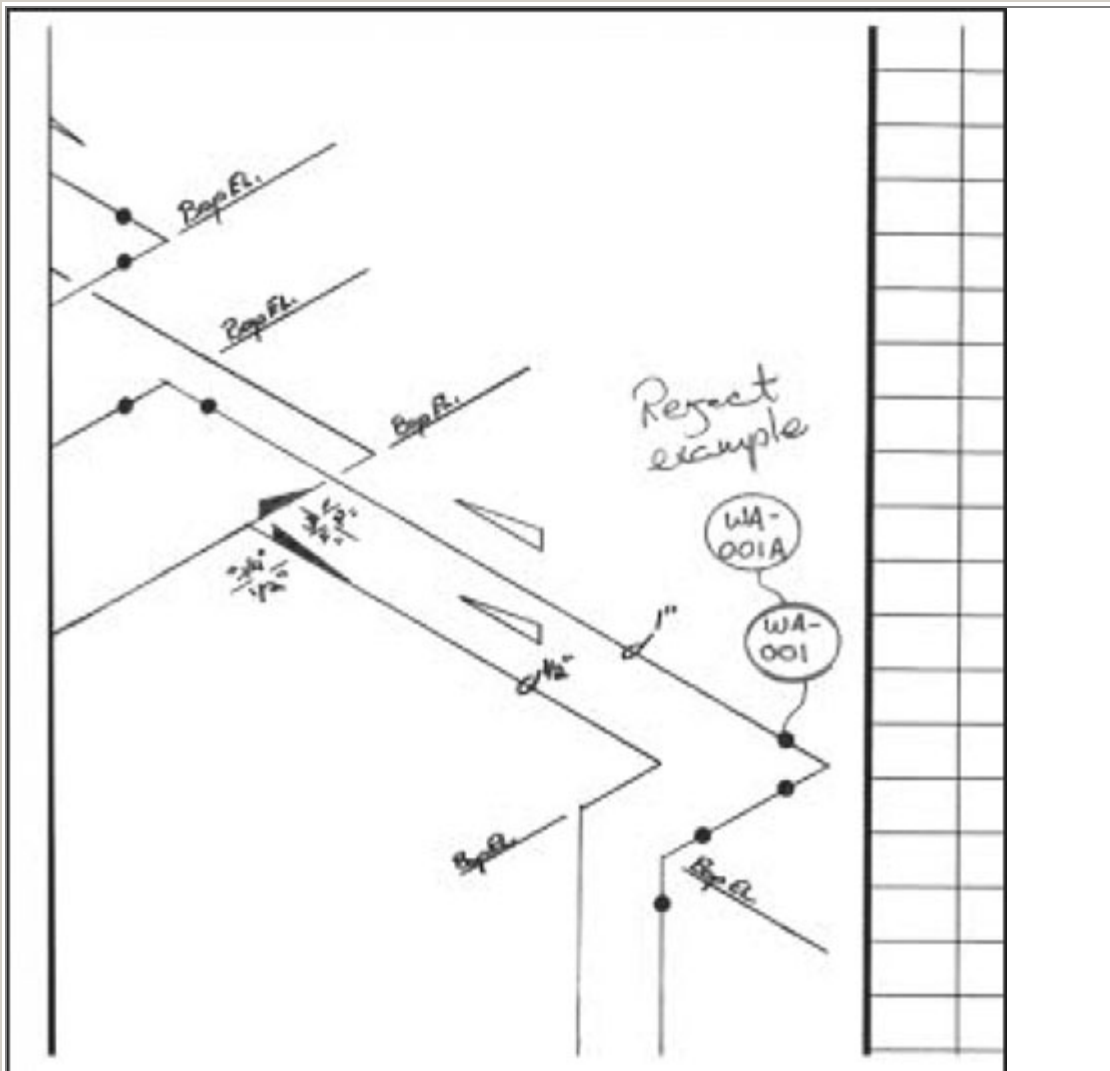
Example of how a rejected weld would be documented on an "iso" drawing. The first weld "window" shows the weld number which is recorded for every weld and the second window indicates that the first weld was cut out, replaced, and the number changed. Courtesy of Pro-Tech Process, Inc.
